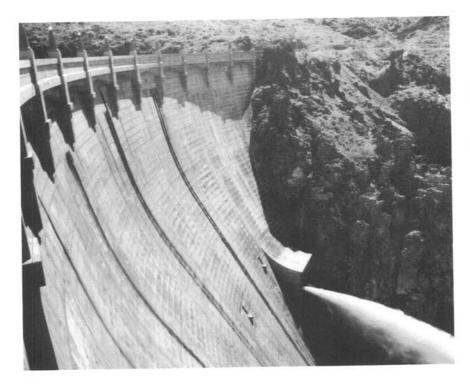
Aerial view of Owyhee Dam looking across the face of dam.
